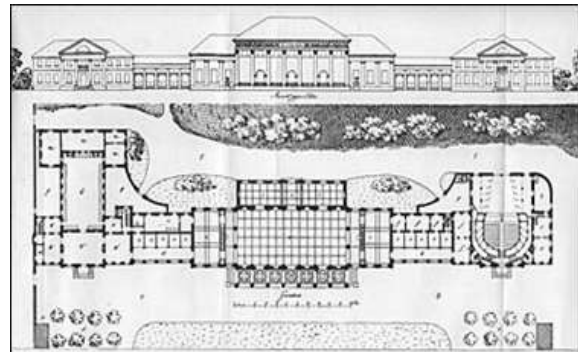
Ground floor plan, Kurhaus Baden-Baden
